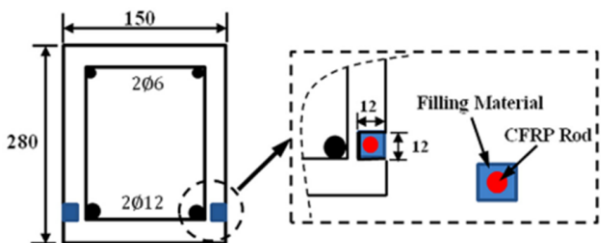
Beam cross section after strengthening with CFRP rod at the level of steel bar
